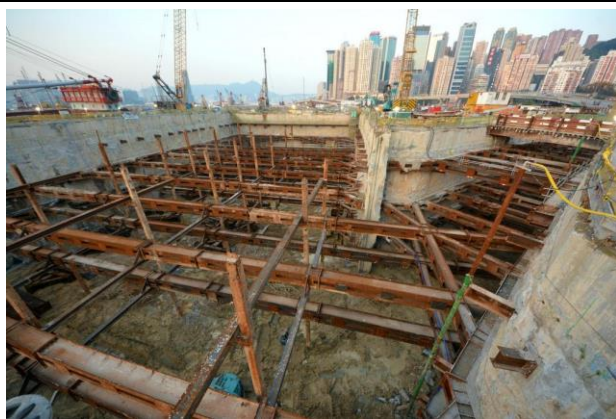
Complicated ELS setting for the section of Central-Wanchai Bypass located inside the Causeway Bay Typhoon Shelter outside Victoria Park.
